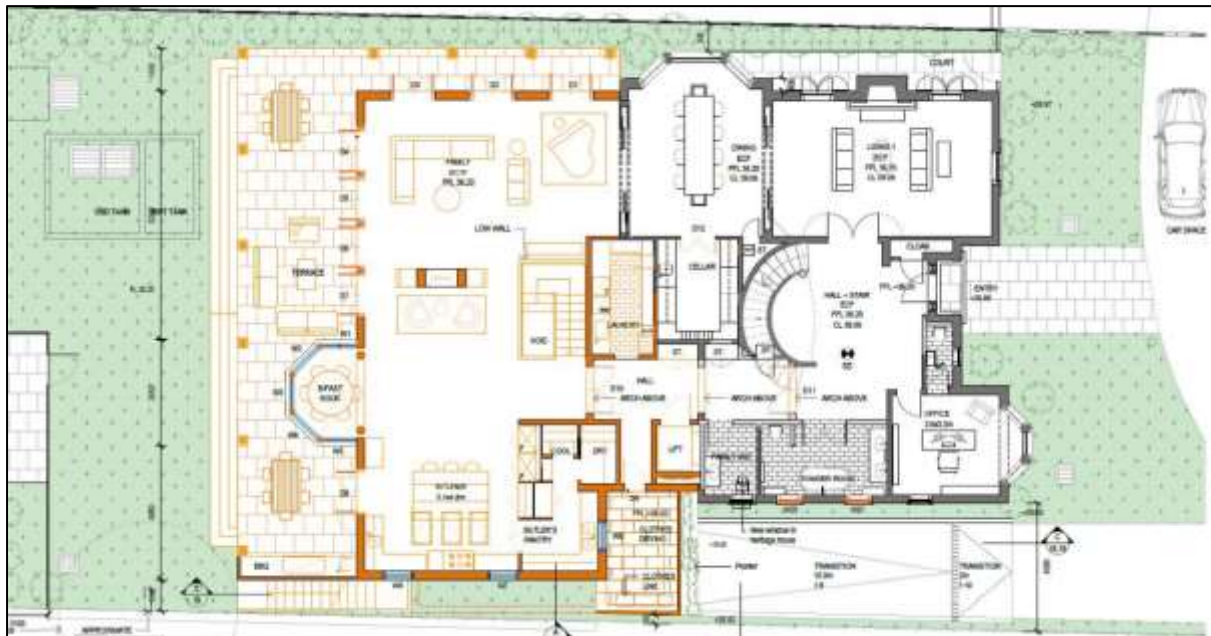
Approved ground floor plan to heritage dwelling under separate DA approval (DA2021/072)
